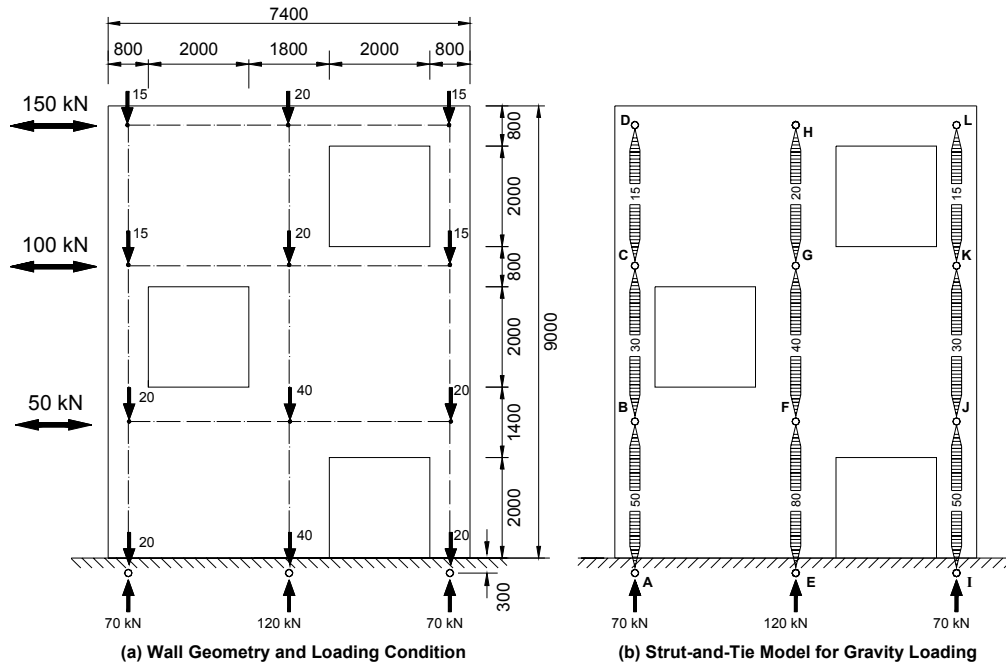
Limited Ductile 3-storey Masonry Wall with Openings
